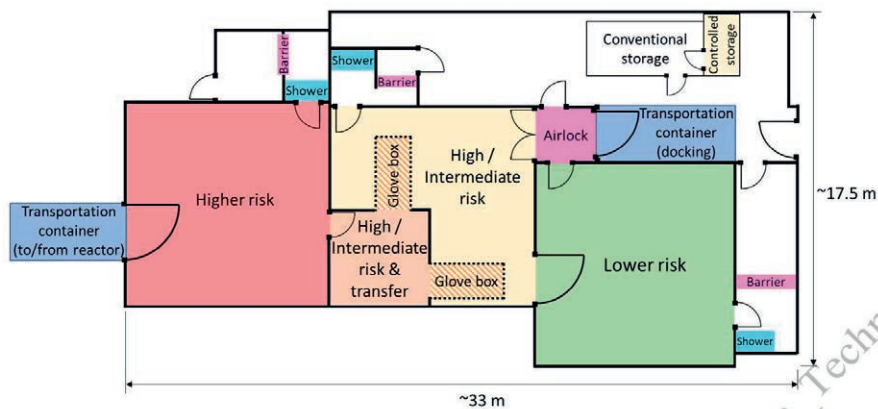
Schematic of the JET Beryllium Handling Facility layout.
